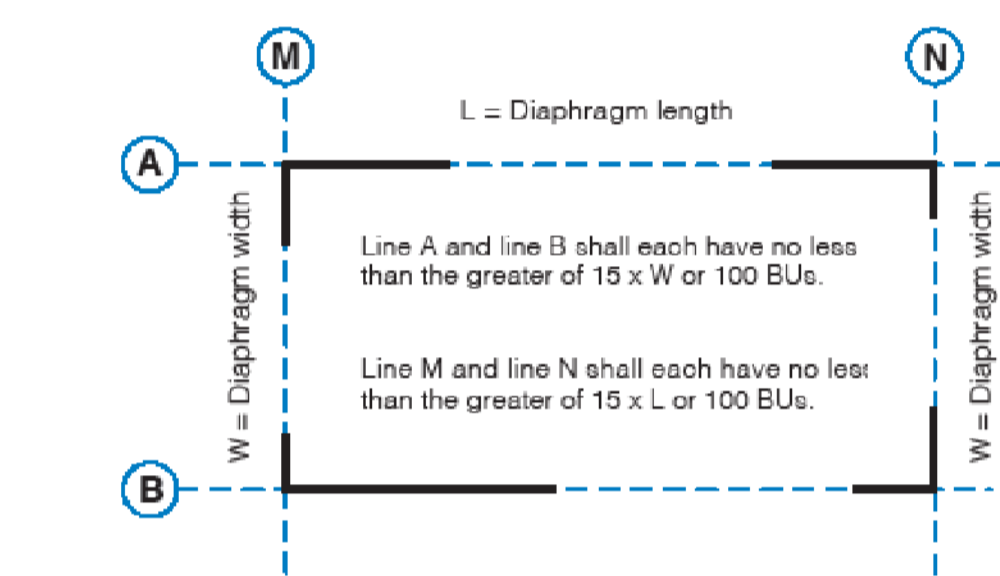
GIB® CEILING DIAPHRAGM SHEET WIDTHS AND LENGTHS
